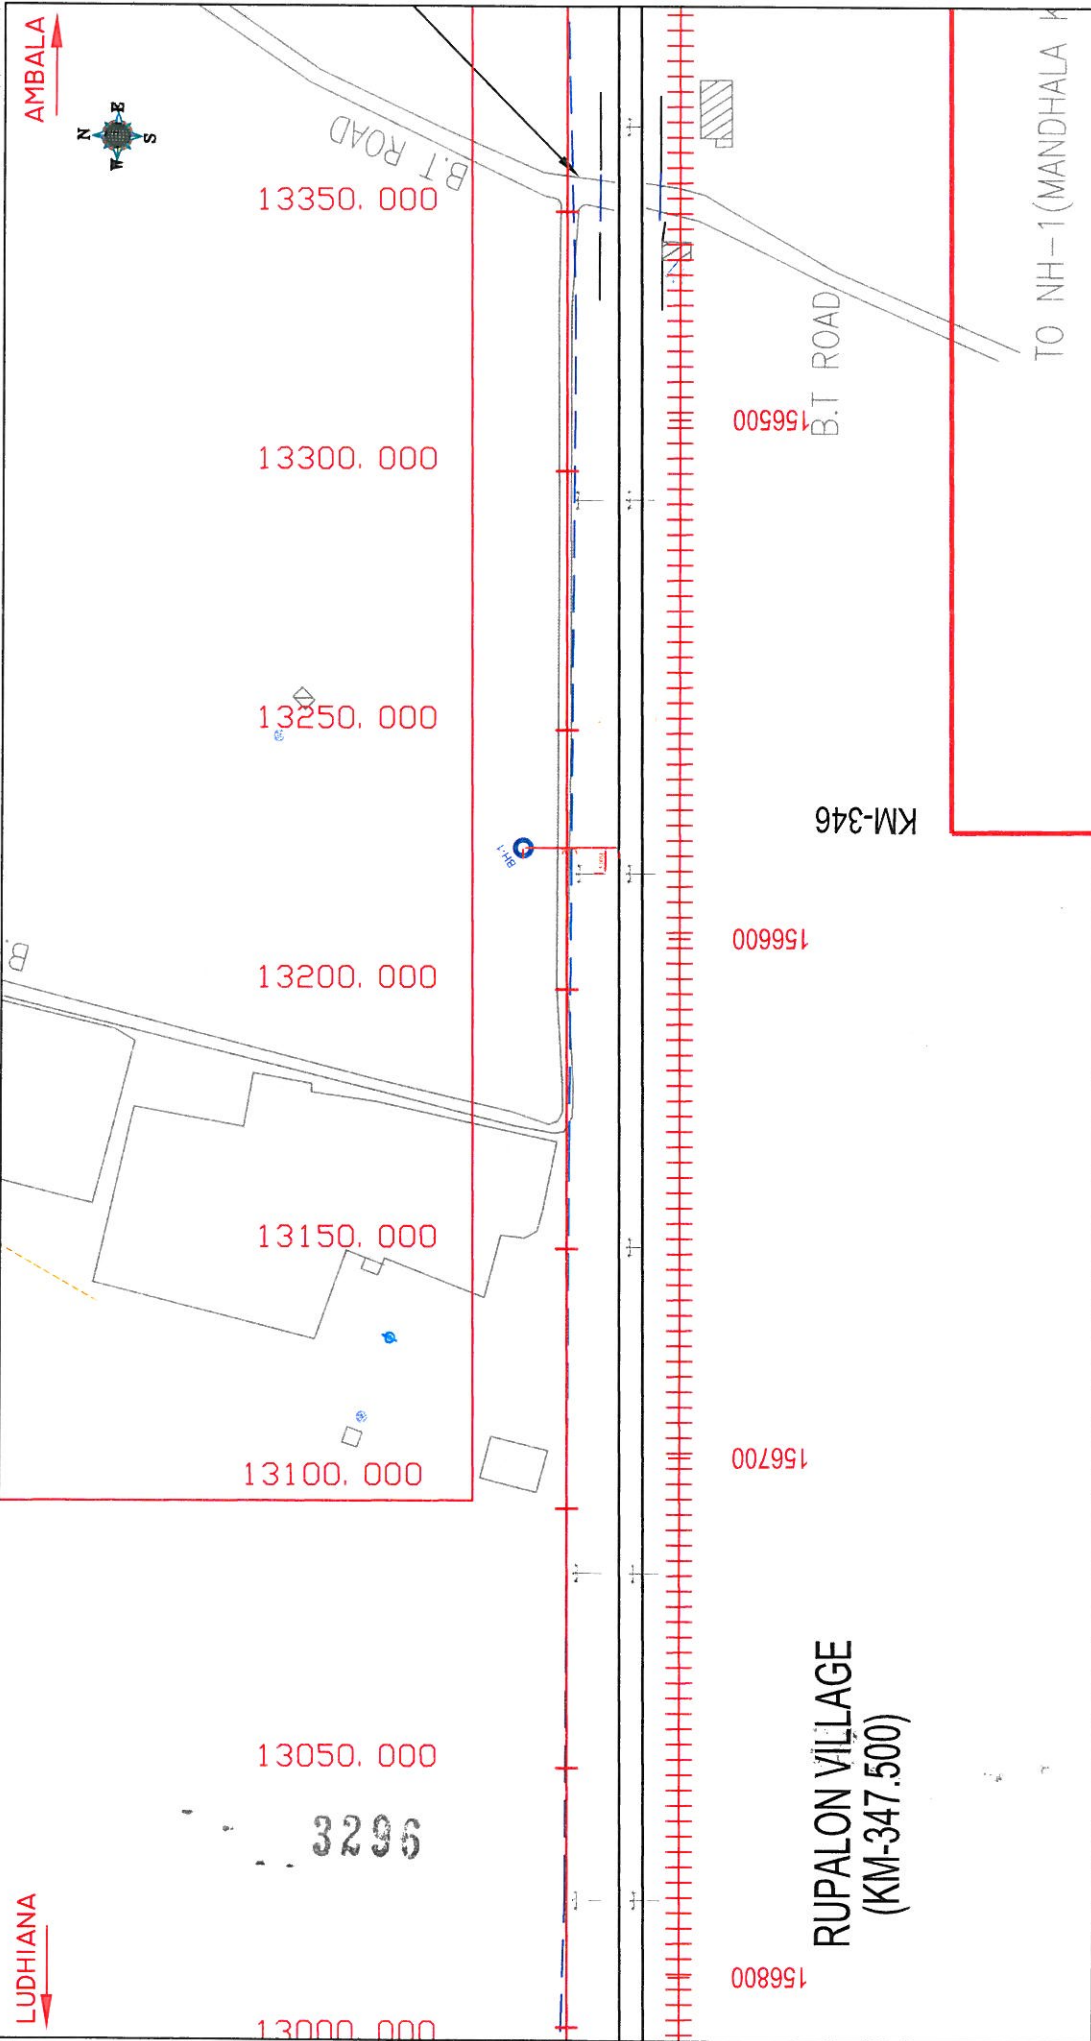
LOCATION PLAN OF PROPOSED ALIGNMENT AT CH. 346/1	PROJECT :- LUDHIANA-AMBALA (DFCCIL)	DESIGN :- CONSULTING ENGINEERS GROUP LTD. E-12, Maji Colony, Malviya Nagar, Jaipur-17 Tel: +91-141-2520899, 2521899, 2520556 Fax: 2521348, E-Mail: ceg@cegroupindia.com
